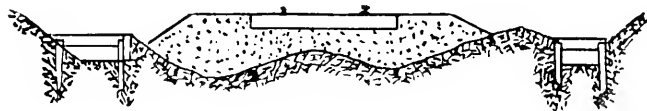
FIG. E—SECTION OF A SINGLE-TRACK ROADBED BUILT IN 1873, SHOWING VERTICAL AND LATERAL DISTORTION OF SUBSOIL.
